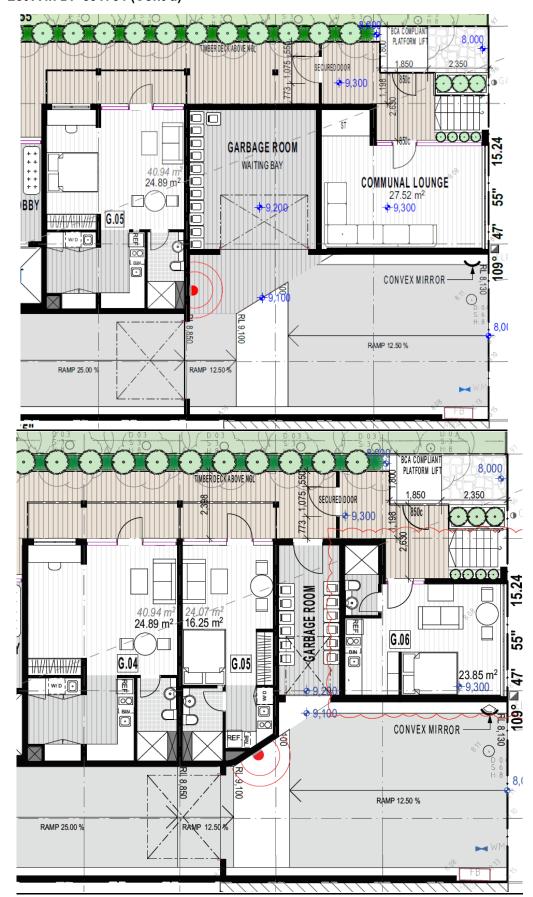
Extract of the ground floor plan refused in the original application (above) and extract of the proposed ground floor plan of the subject 8.2A application (below).
